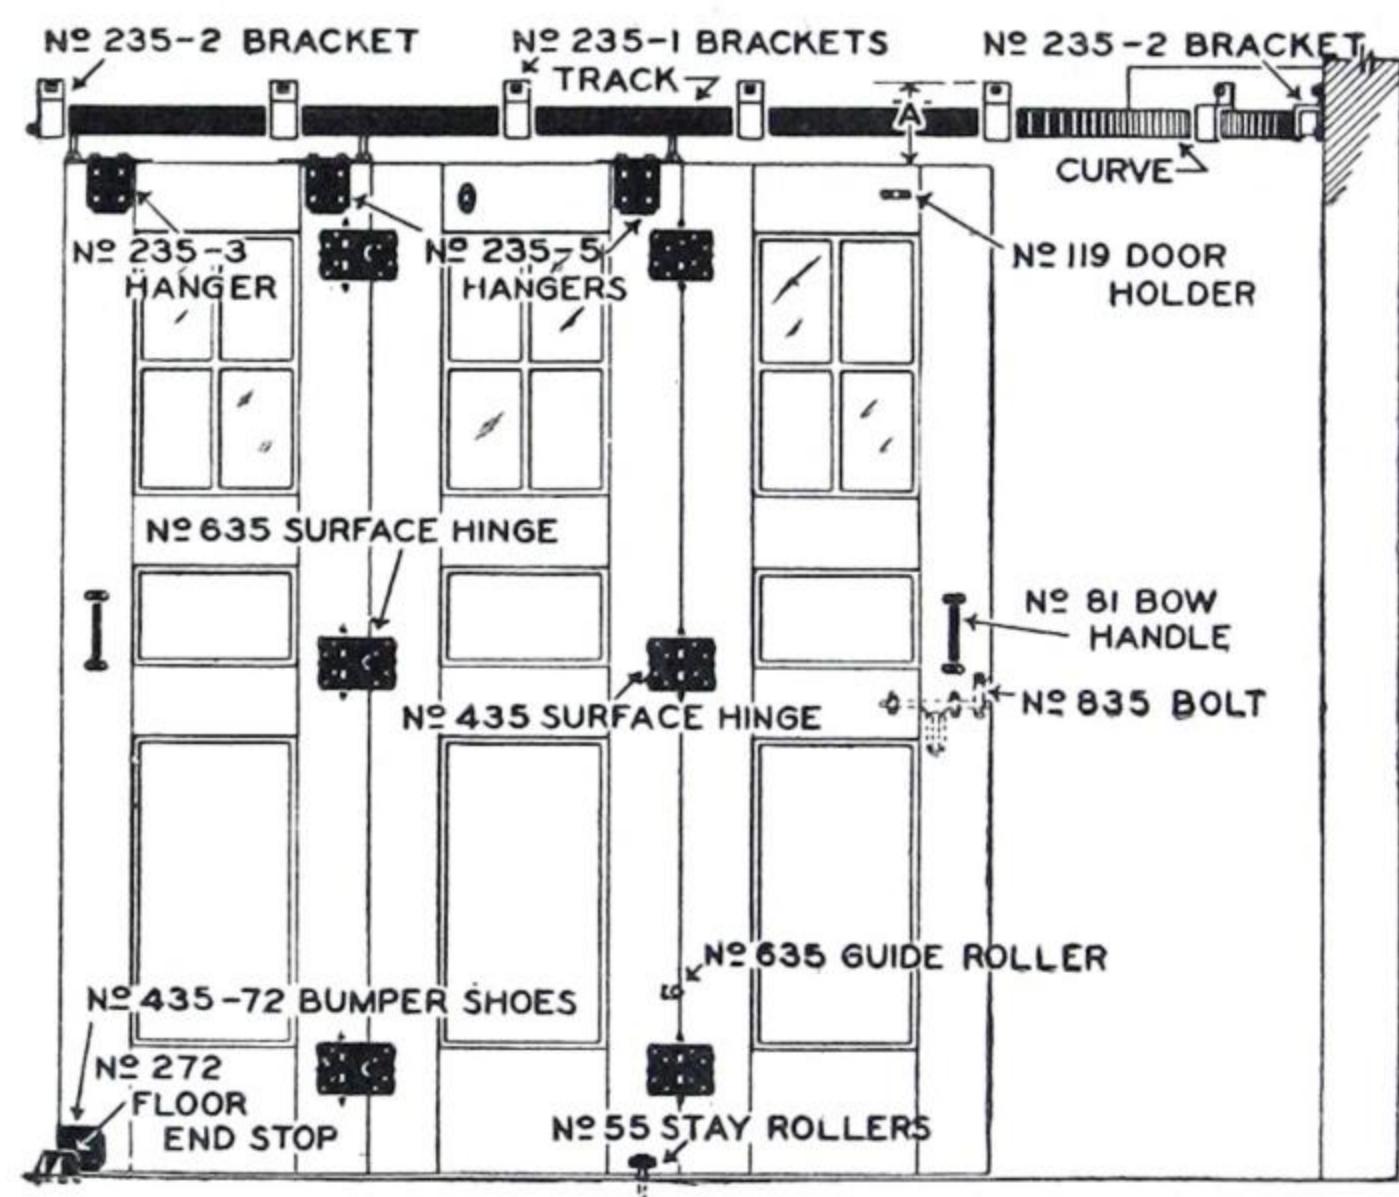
Interior elevation showing proper location and names of 235 Parts for Set JJ-1, including one 835 Door Bolt.
